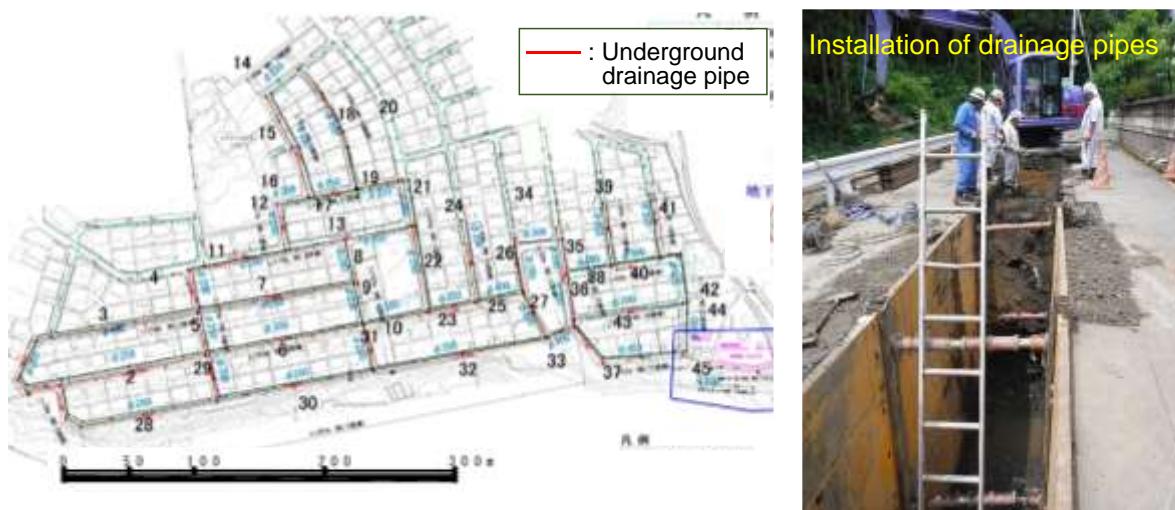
Layout diagram of underground drainage pipes Yasuda and Hashimoto (2016)
